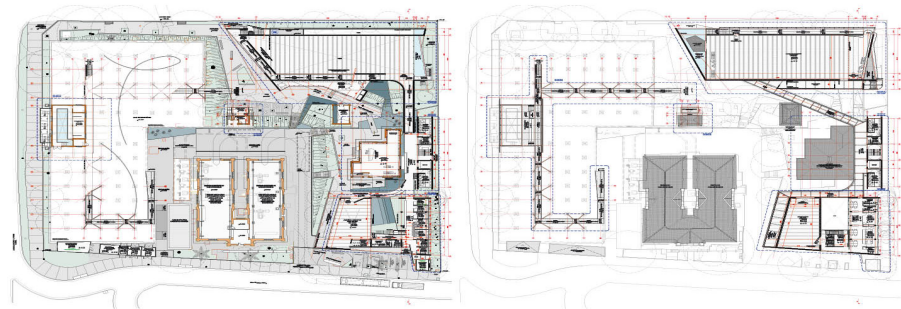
Ground floor plan – level 760.29 and Upper floor plan levels 764.49 and 764.74. The existing buildings are represented in orange, and the new constructions are in black. The Water Museum is located on the opposite section of the existing reservoir, relating to the clearings in the existing vegetation. Source: SIAA.
